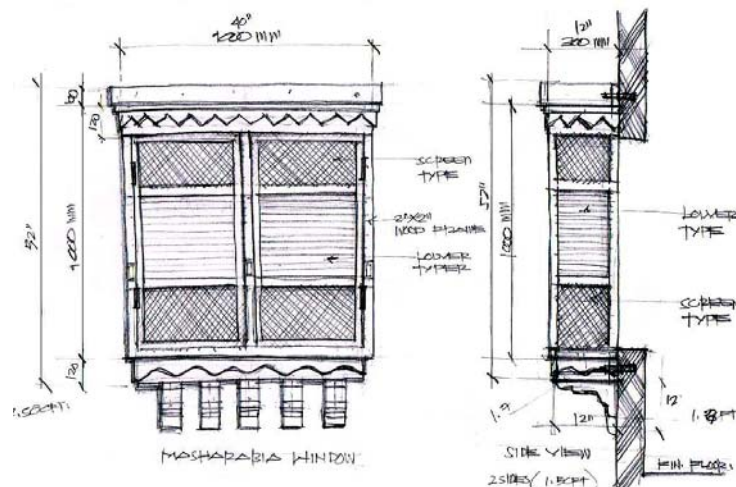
Wooden Mashrabiya drawn by Developers Wooden Furniture Factory based in Bahrain.
